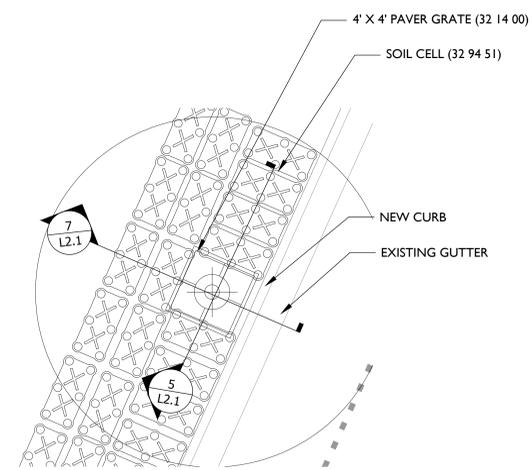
DETAIL OF TREE PLANTING IN SOIL CELLS NEXT TO NEW CURB
